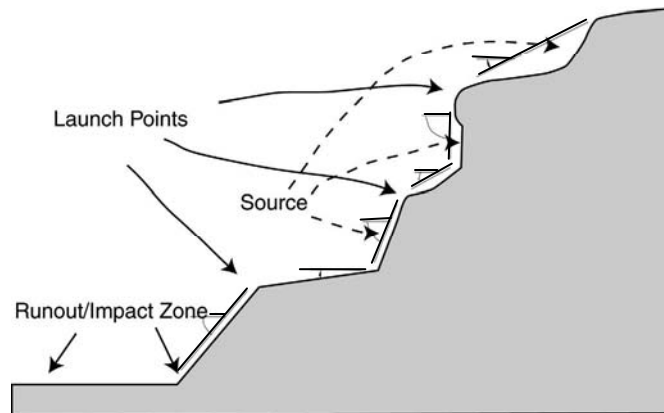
Illustration. Effective rockfall protection design requires an accurate slope profile, which identifies source areas, launch points, and runout zones (Brawner 1994).
